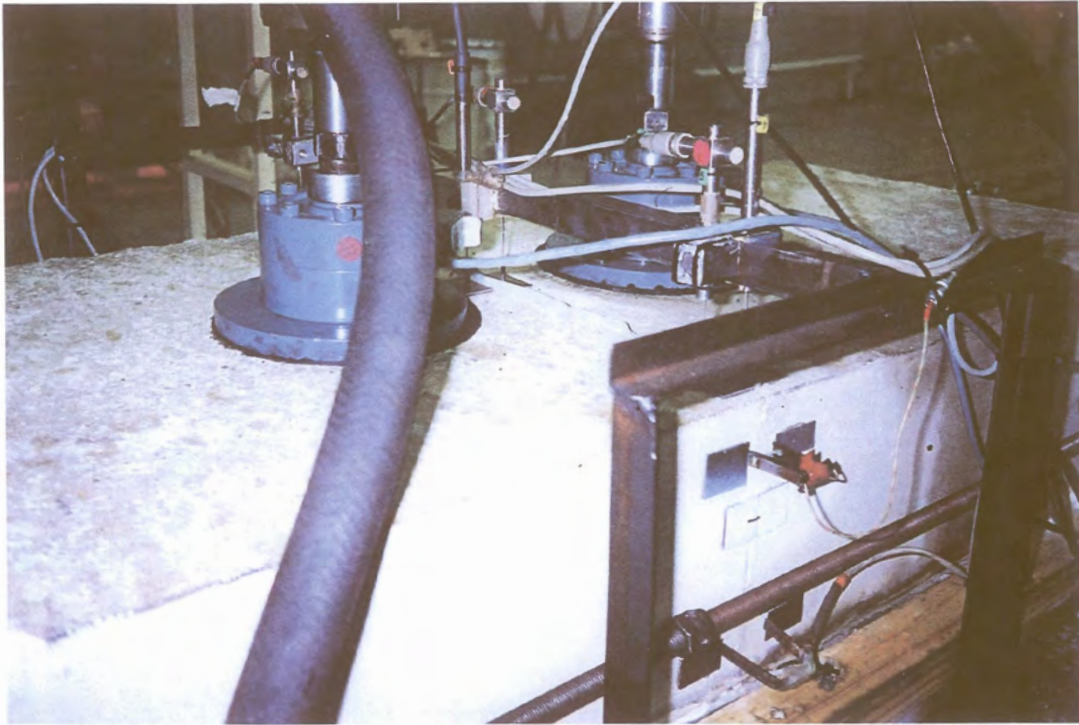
Pre-deformed plastic joint with edge of plastic sticking out on top of concrete surface – Experiment 5
